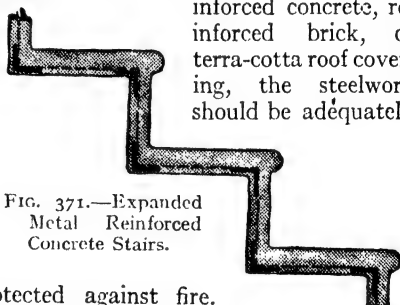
Expanded Metal Reinforced Concrete Stairs.
